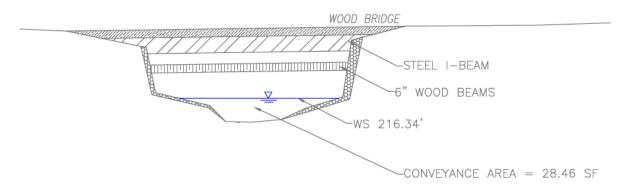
Farm bridge cross-section looking downstream (bottom of wood beams approximately 3 feet above thalweg; bottom of wood beams approximately 4 feet above thalweg).
